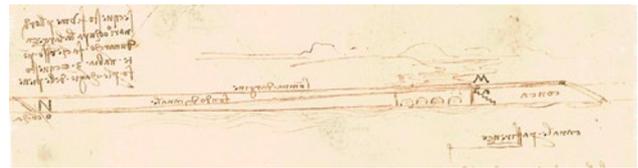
C.A., fol. 126v, detail: cross section of the canal bridge.
